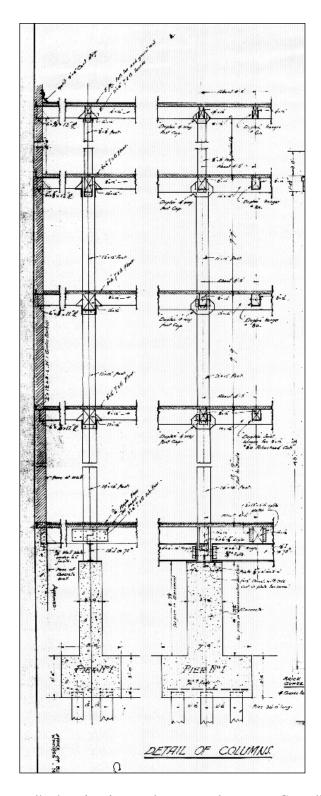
"Detail of Columns", showing internal structural system, Canadian National Railways, Storage Warehouse, 1927. (<u>Historical Buildings and Resources Committee</u>.)
